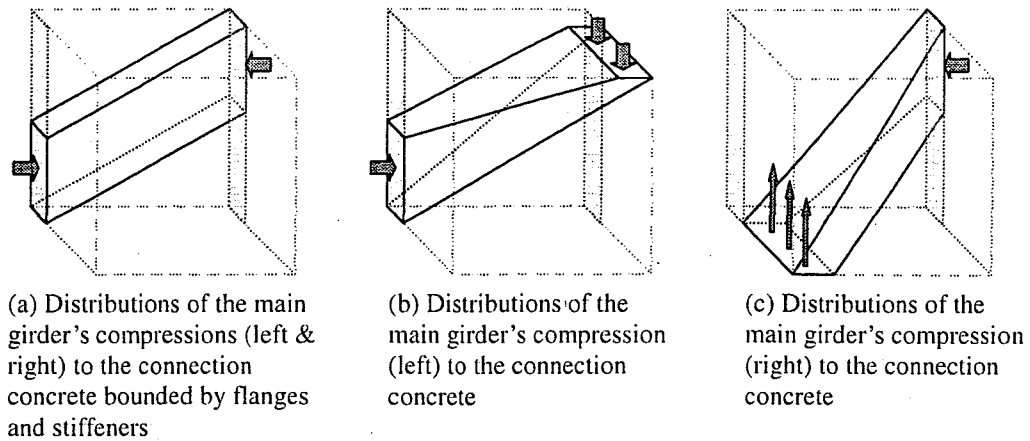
Force transfer mechanisms inside connection concrete of specimen C-1.
